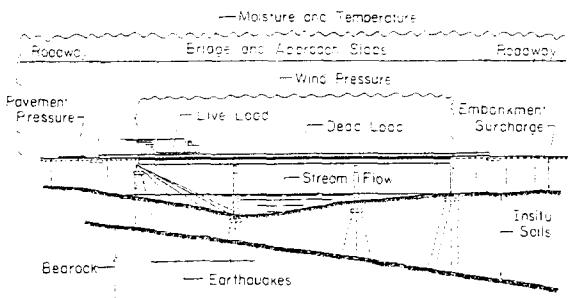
A composite structure (consisting of superstructure, piers, abutments, foundations, pavements, embankments, in situ subsoils, etc.).
